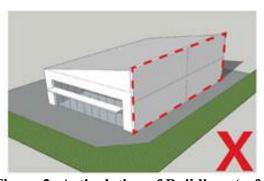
Articulation of Buildings (refer Cl 4.2.8)
